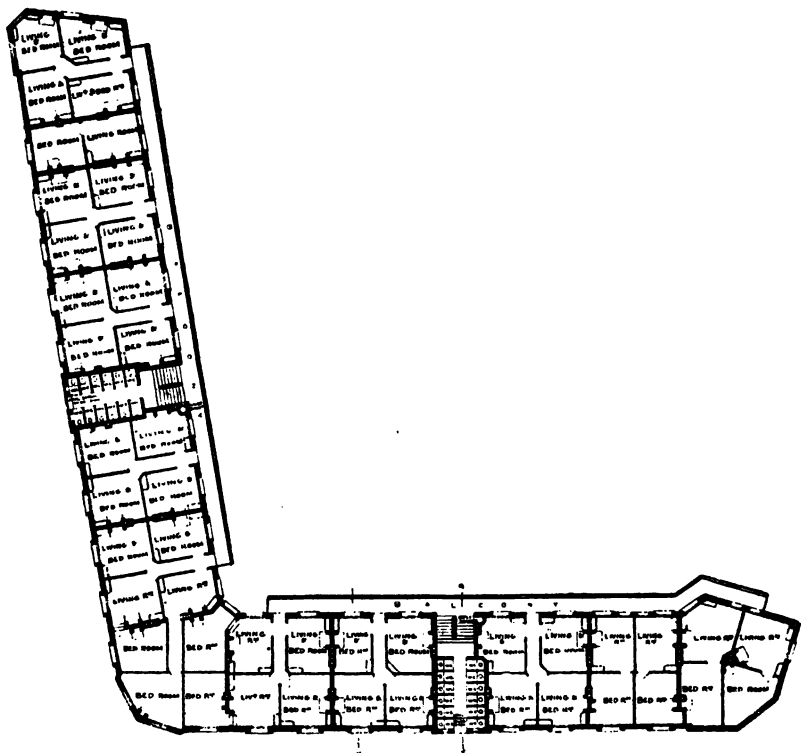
FIG. VI. South London Dwellings Company Limited, Kennington Road, South Lambeth, (1st floor Plan).
